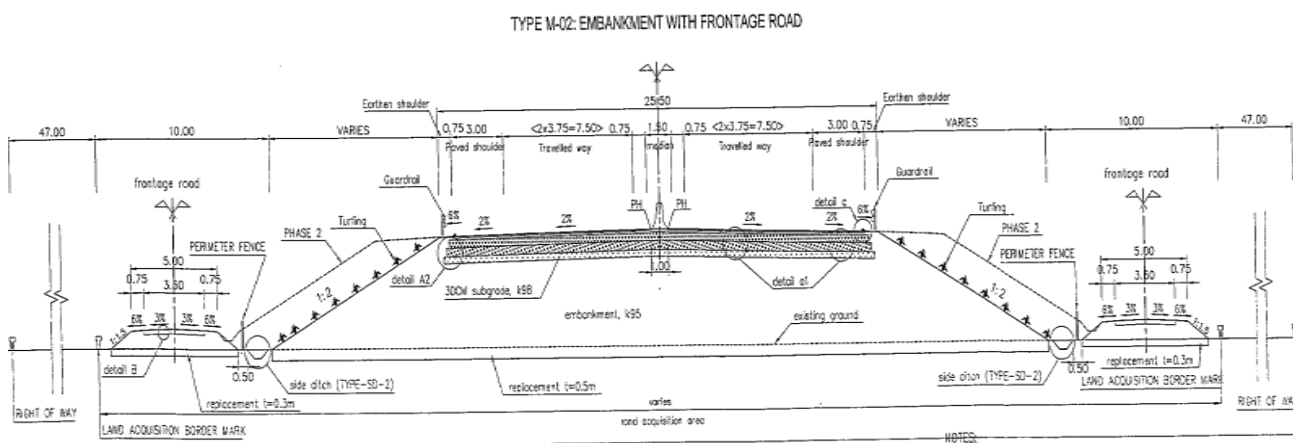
Typical Cross Section of Embankment Section with Frontage Road
